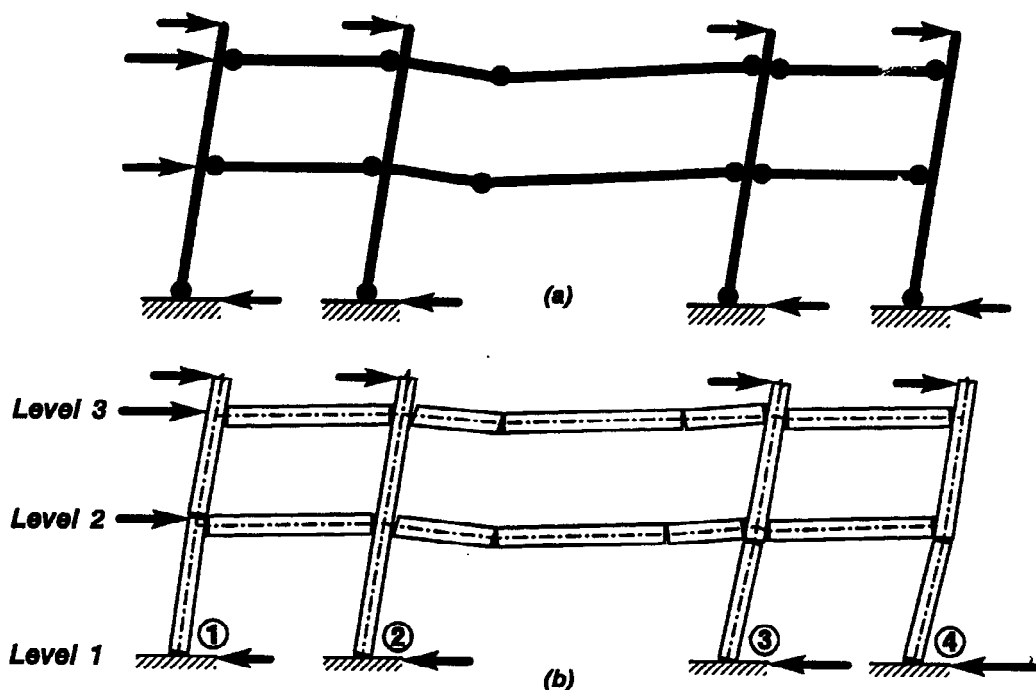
The effects of inelastic beam elongations on first storey columns.
